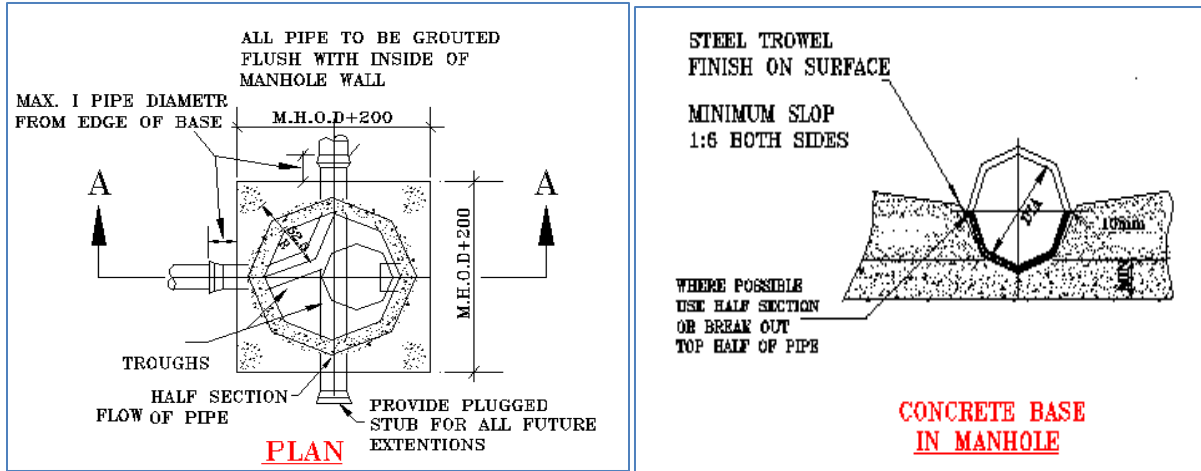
Proposed Plan and Concrete bases in circular manhole
